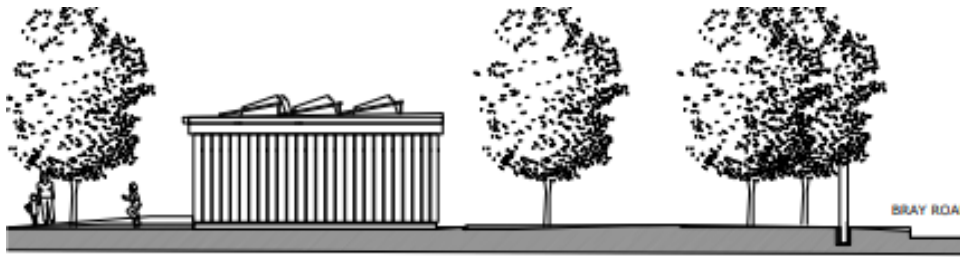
Elevations of existing Gate lodge site (Source: Cubetecture Design Ltd.)
